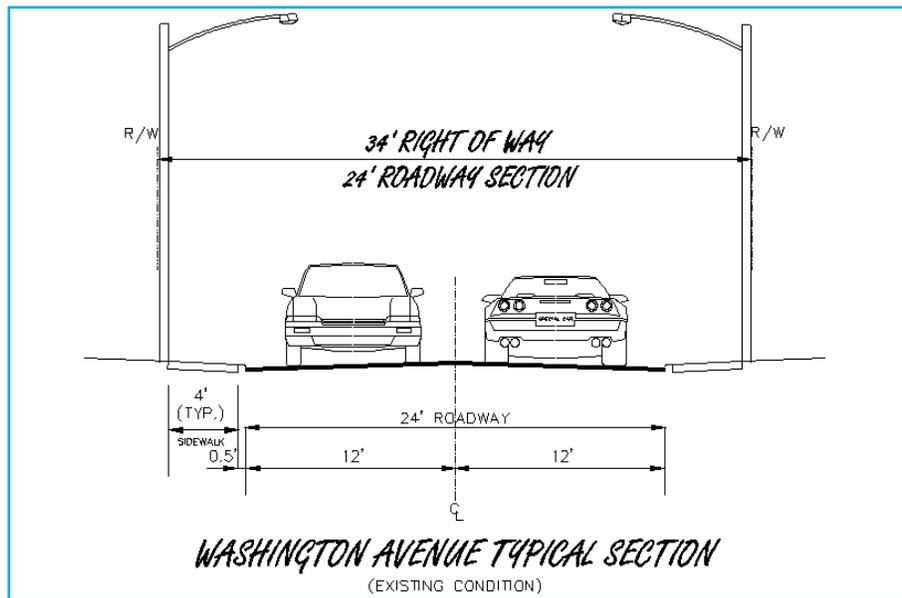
2: WASHINGTON AVE. TYPICAL SECTION – 34’ R/W – 24’ PAVEMENT WIDTH
